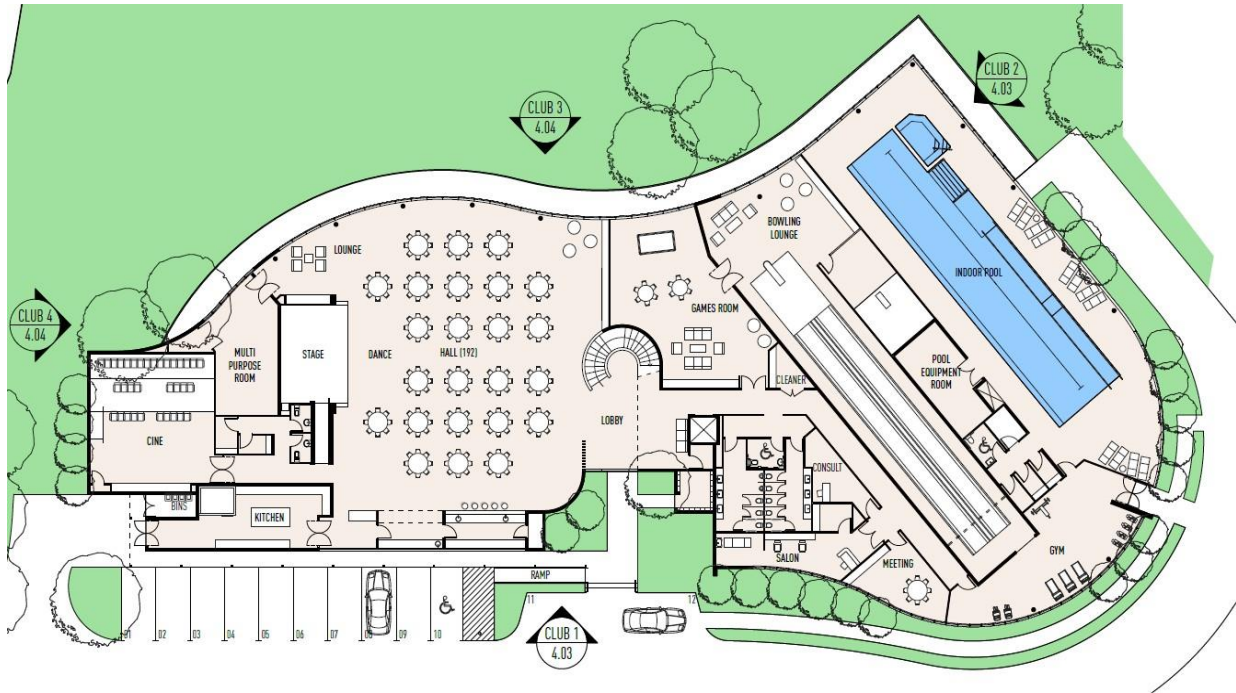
Clubhouse Ground Floor Plan (Source: Architectural Plans)
